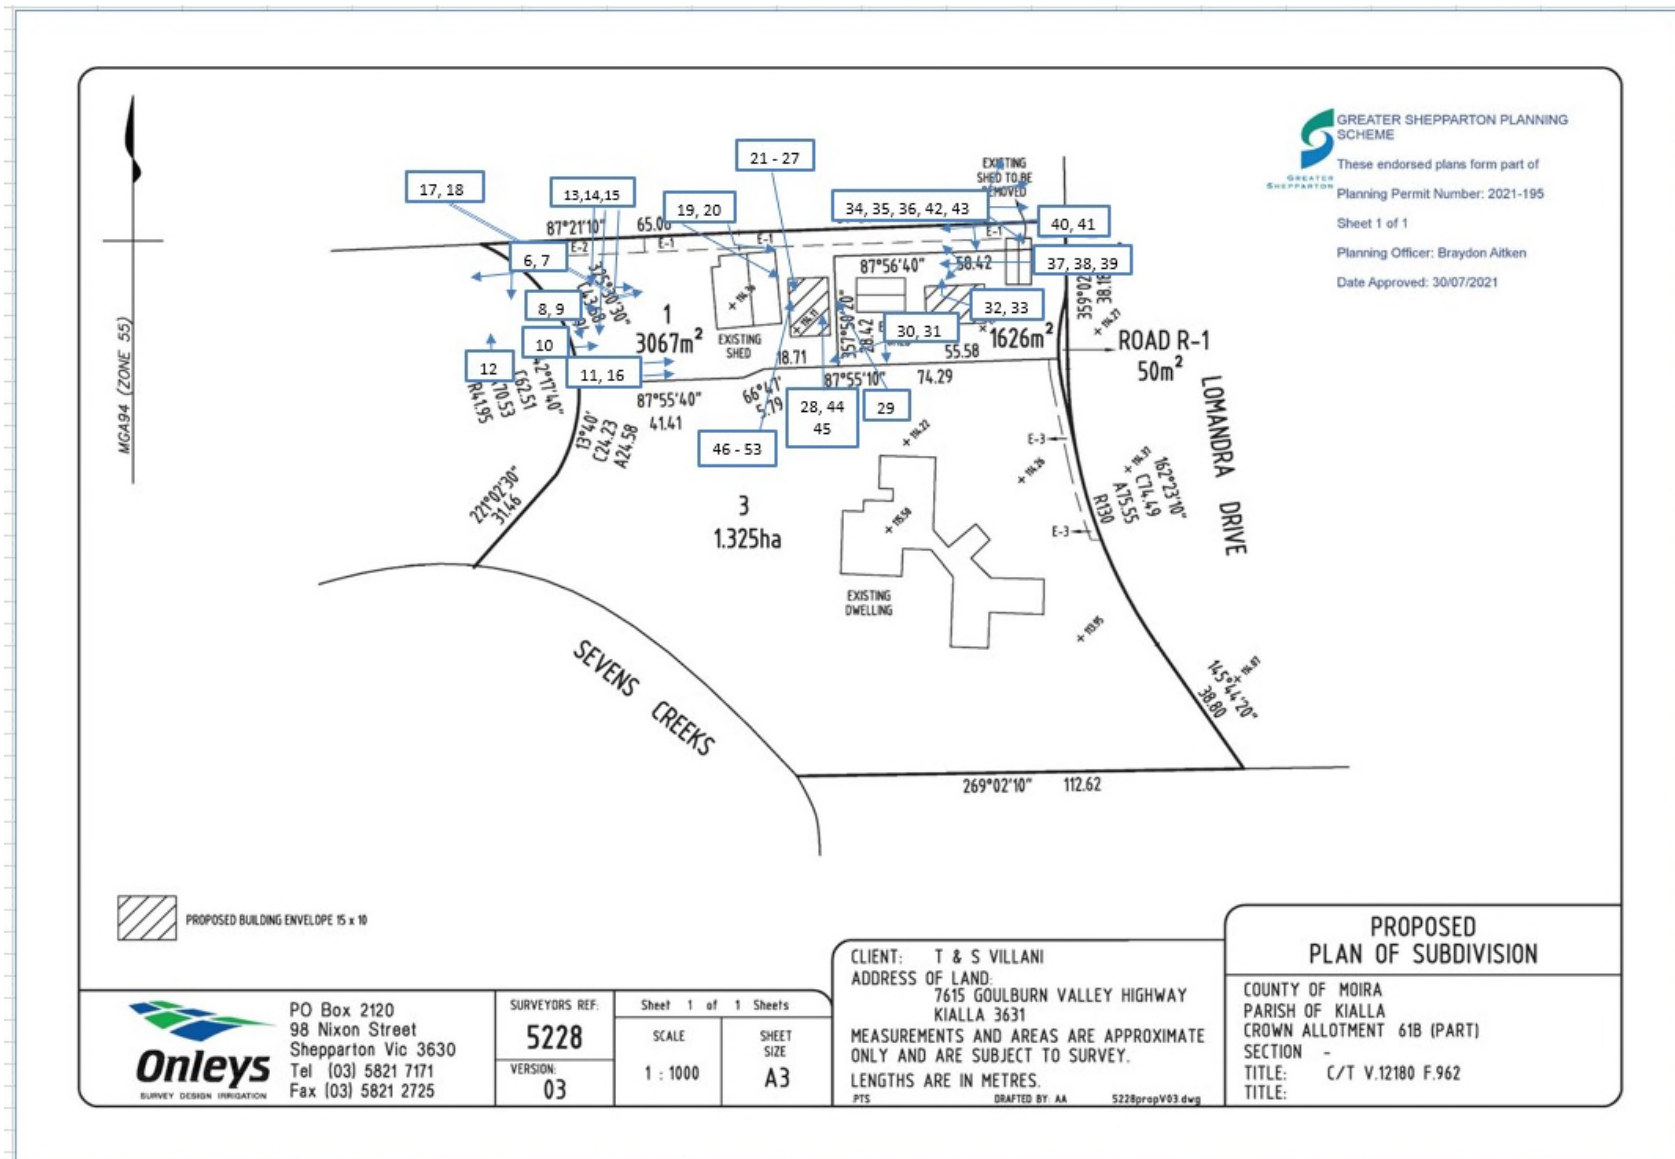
Photo location plan 2 (Photos 6-53) - 34 Lomandra Drive and surrounds, Kialla
